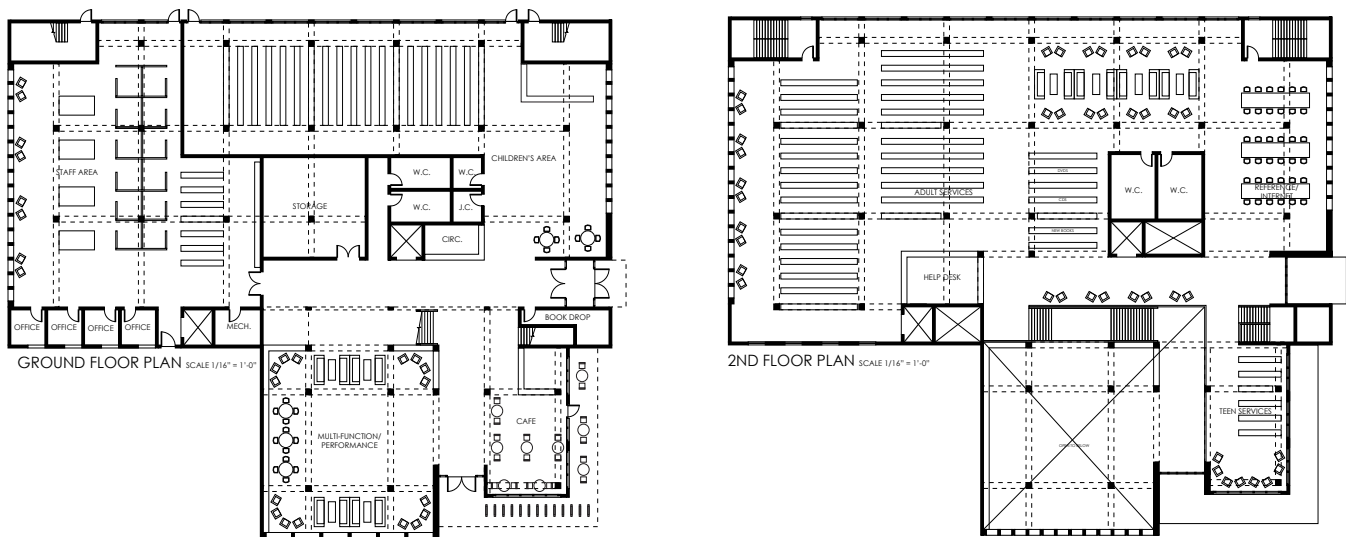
and 62: First floor plan (left) second floor plan (right) (Ian Austin).
